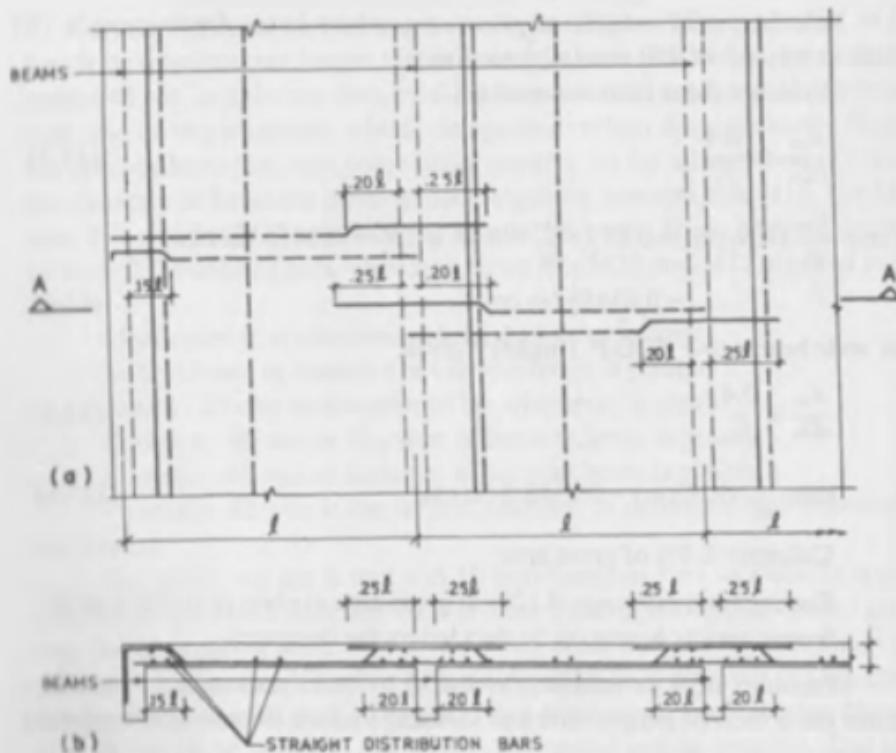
Steel arrangement in one-way and two-way continuous slab panels. (a) Plan of one way slab panels; (b) Section A-A.
